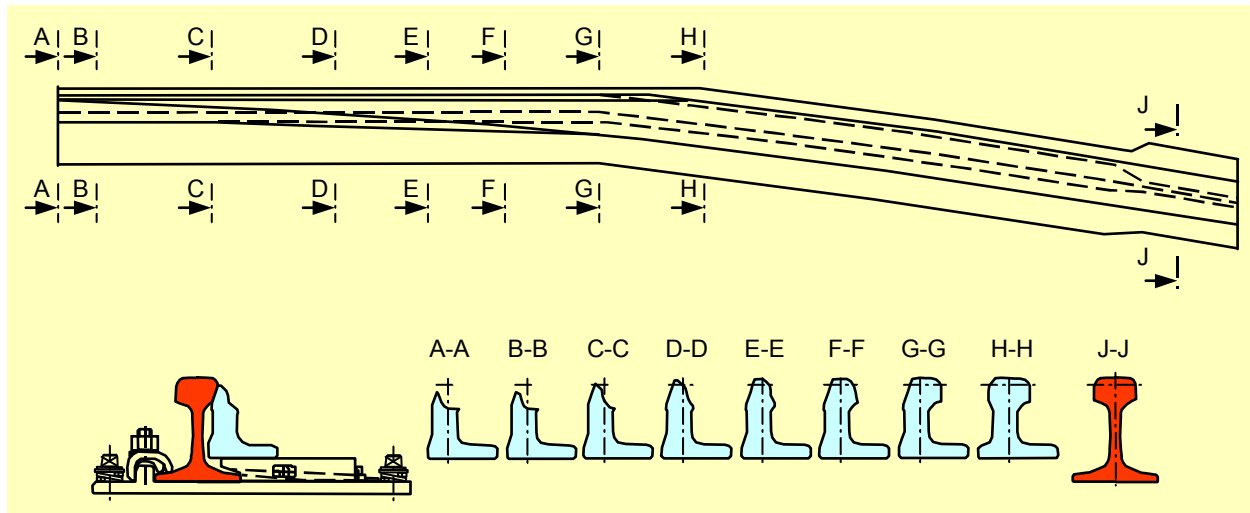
Cross-sectional drawing of switch blade and stock rail
